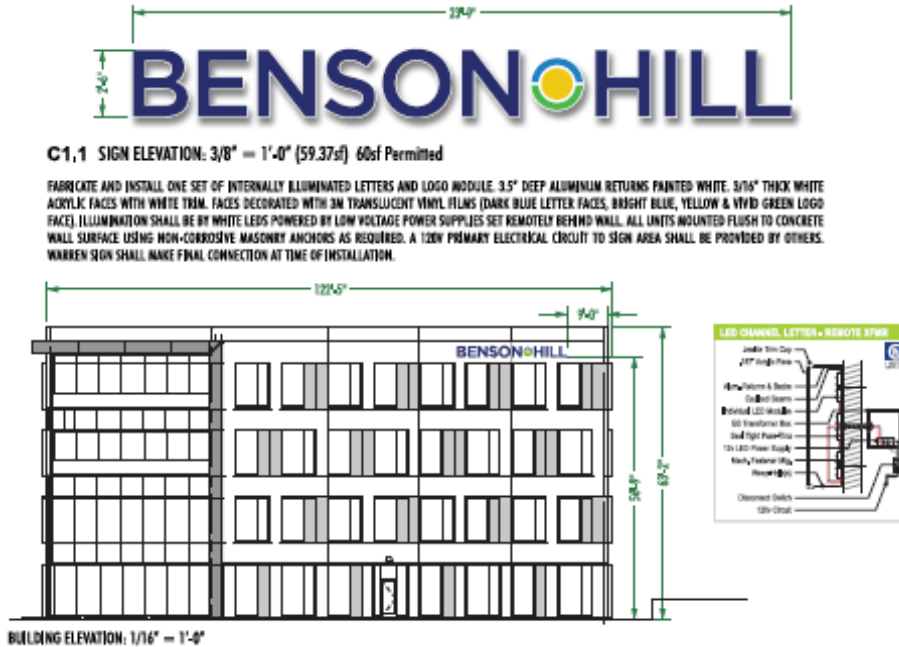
Proposed 60 sq. ft. sign for the South Elevation of the building under construction
